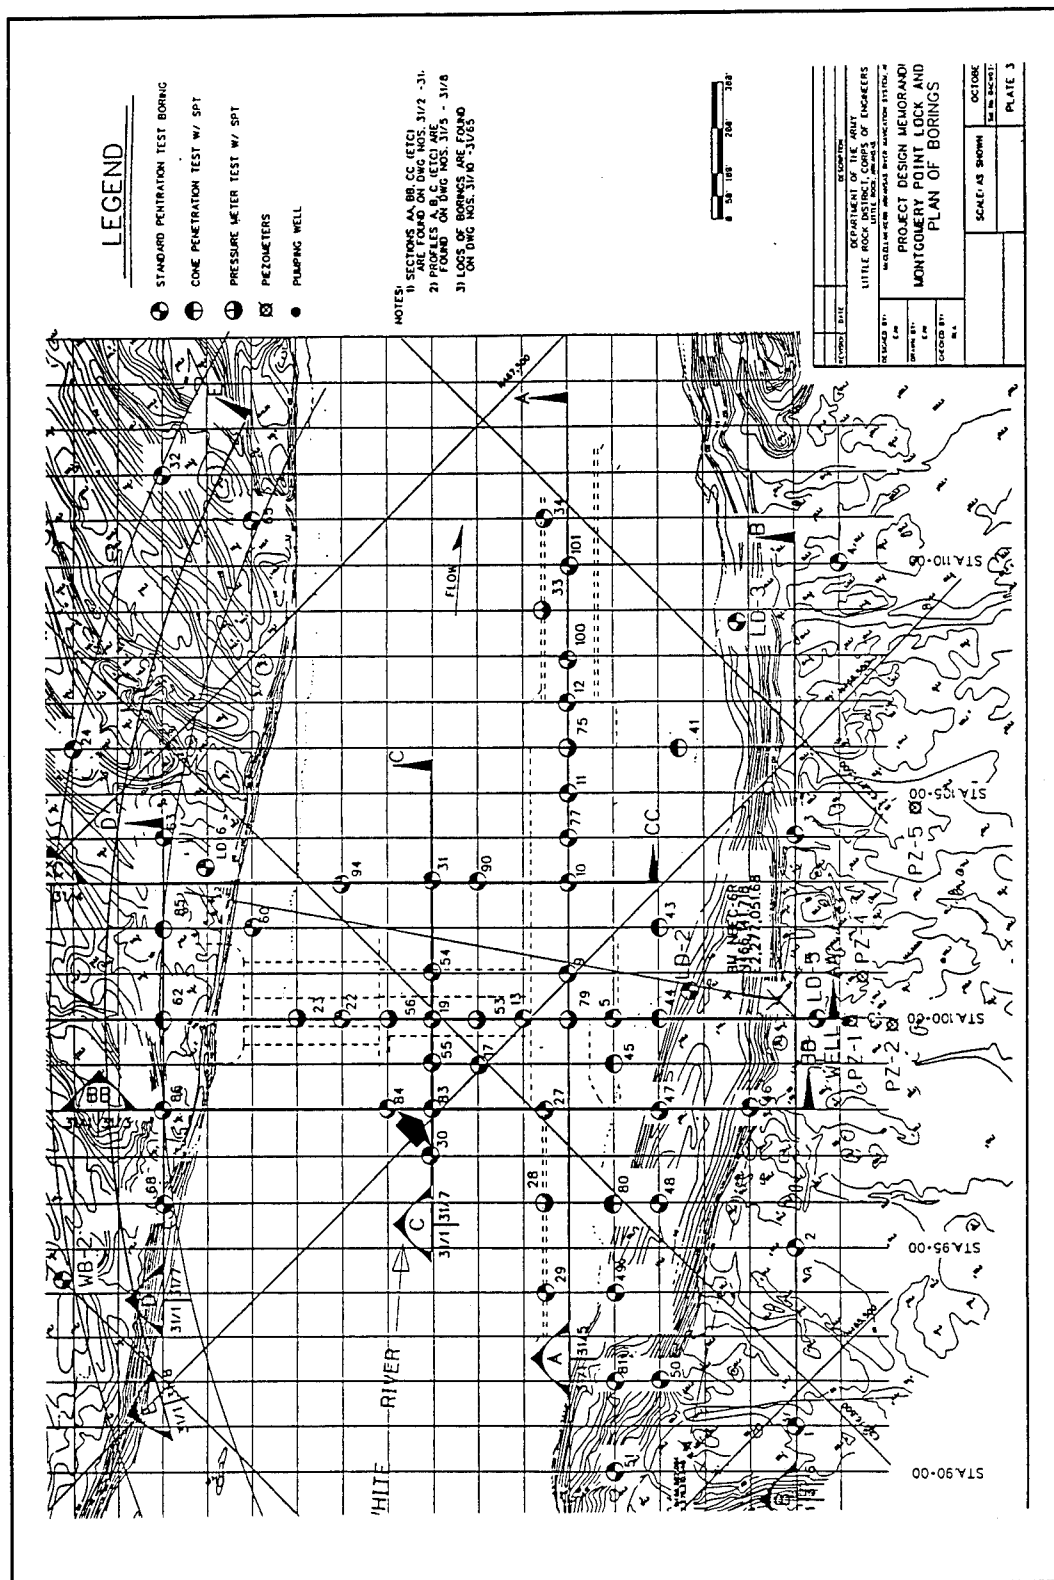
Montgomery Point Lock and Dam. Plan of borings at the site (Design Memorandum No. 1, Plate 31/1)
